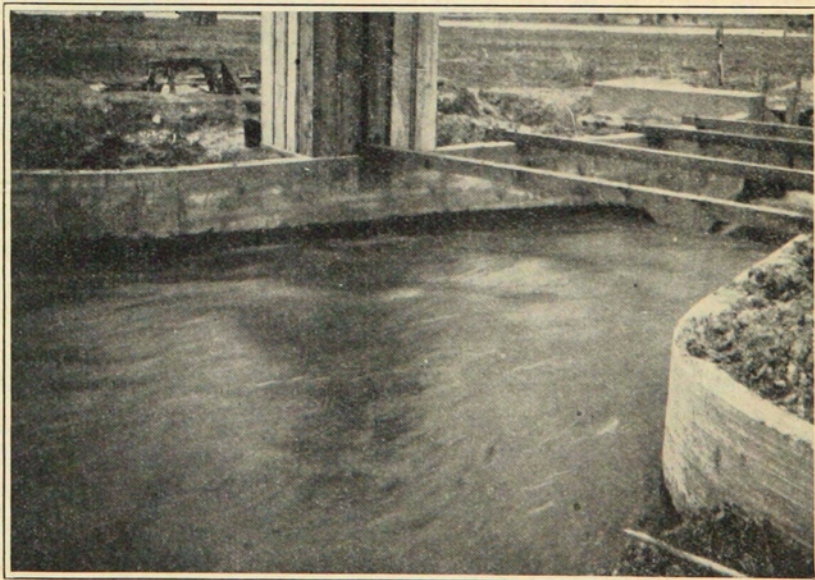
Ten-foot Reinforced Concrete Improved Venturi Flume Discharging 200 Second-feet. Dye Lake Outlet, near Rocky Ford, Colorado.
